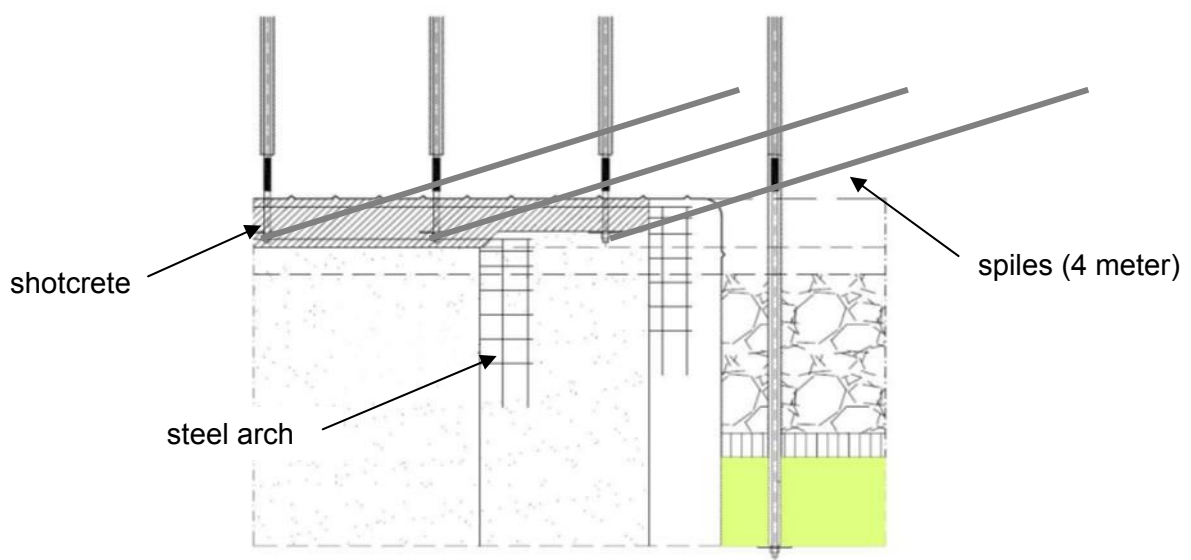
, tunnel enlargement with the use of spiles (source Beton- und Monierbau)
